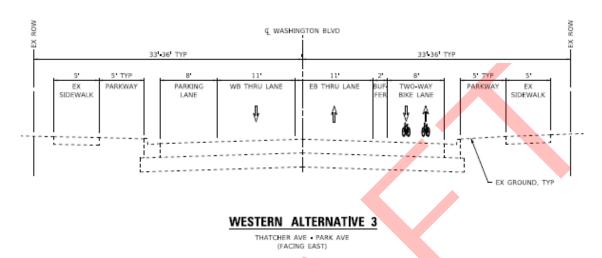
Western Typical Section Alternative 3 Washington Blvd.
